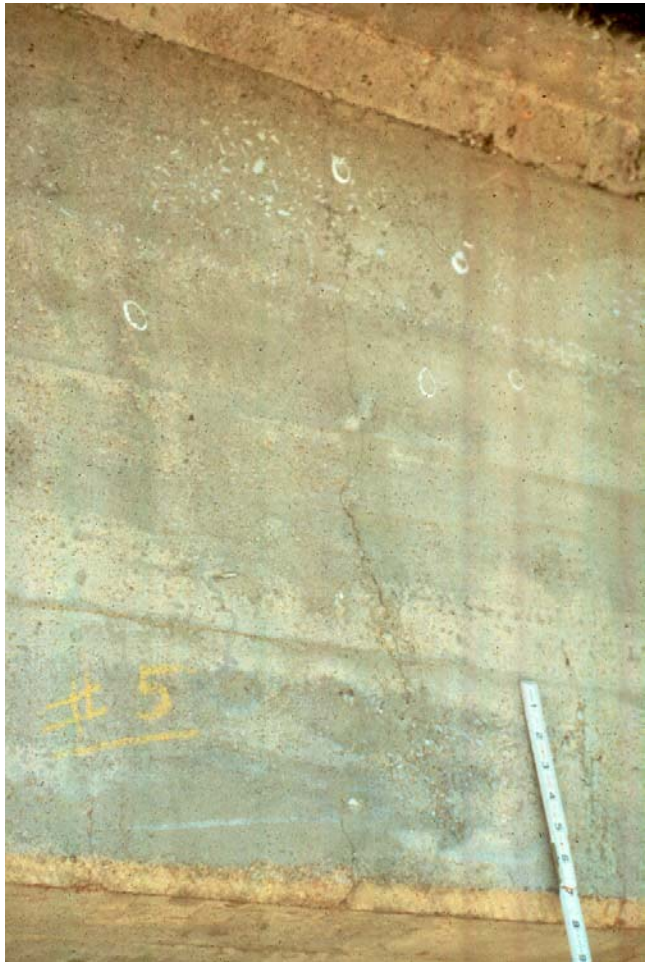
Flexure Cracks on a Tee Beam
